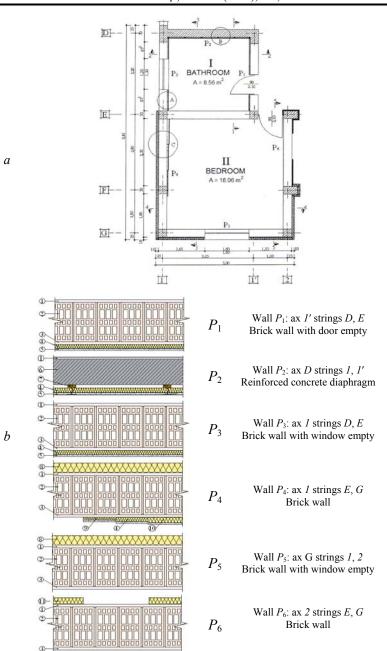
a – Residential building groundfloor; b – the horizontal sections for each type of tested wall: 1 – interior plaster; 2 – brick wall; 3 – interior plaster; 4 – polystyren of 3 cm thickness; 5 – reinforced plaster plates; 6 – reinforced concrete diaphragm; 7 – wooden slats; 8 – polystyren of 10 cm thickness; 9 – polystyren of 2 cm thickness; 10 – polystyren of 4 cm thickness; 11 – polystyren of 5 cm thickness.
